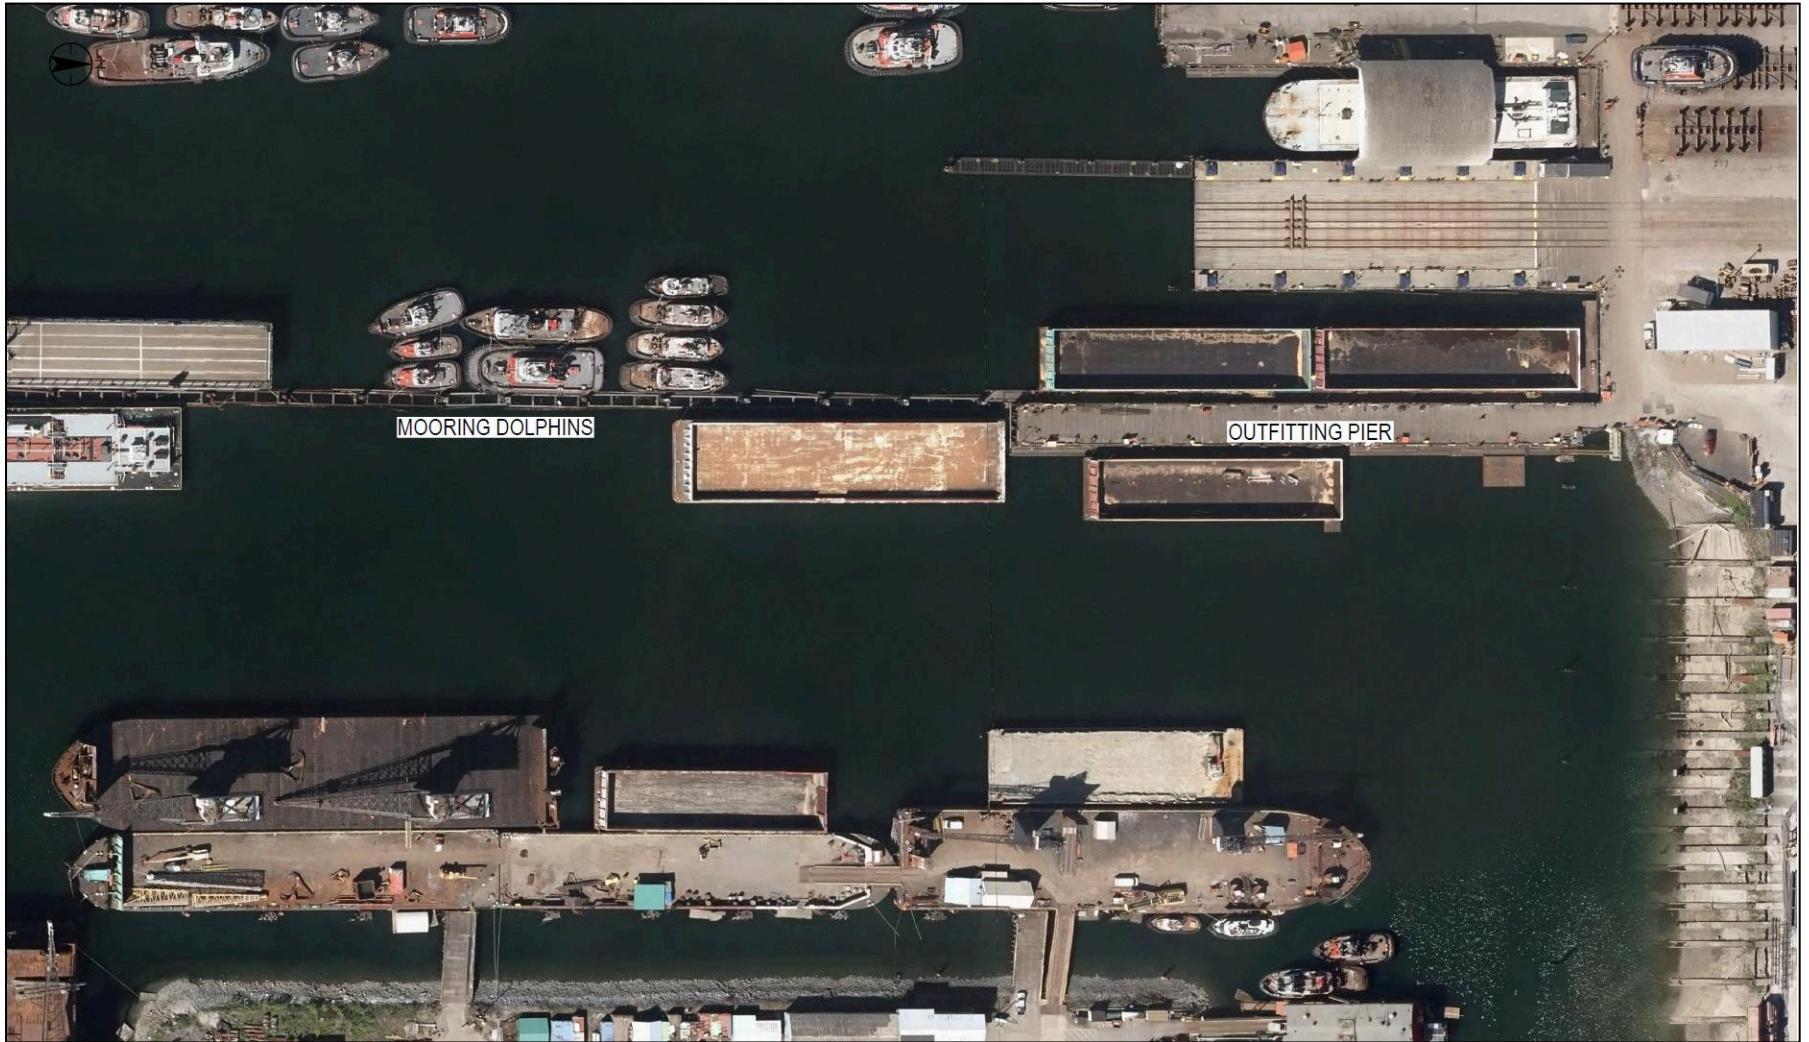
Seaspan Vancouver Shipyard Existing Outfitting Pier Site Plan
